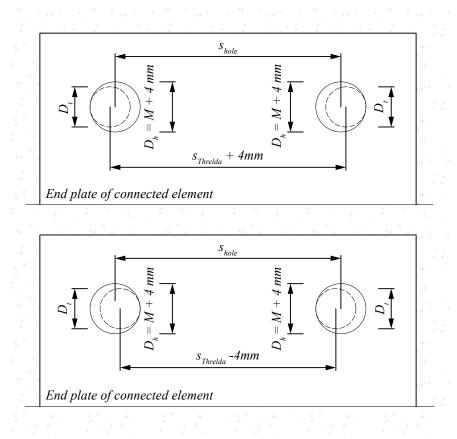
Tolerances for holes for bolts on connected end plate.
